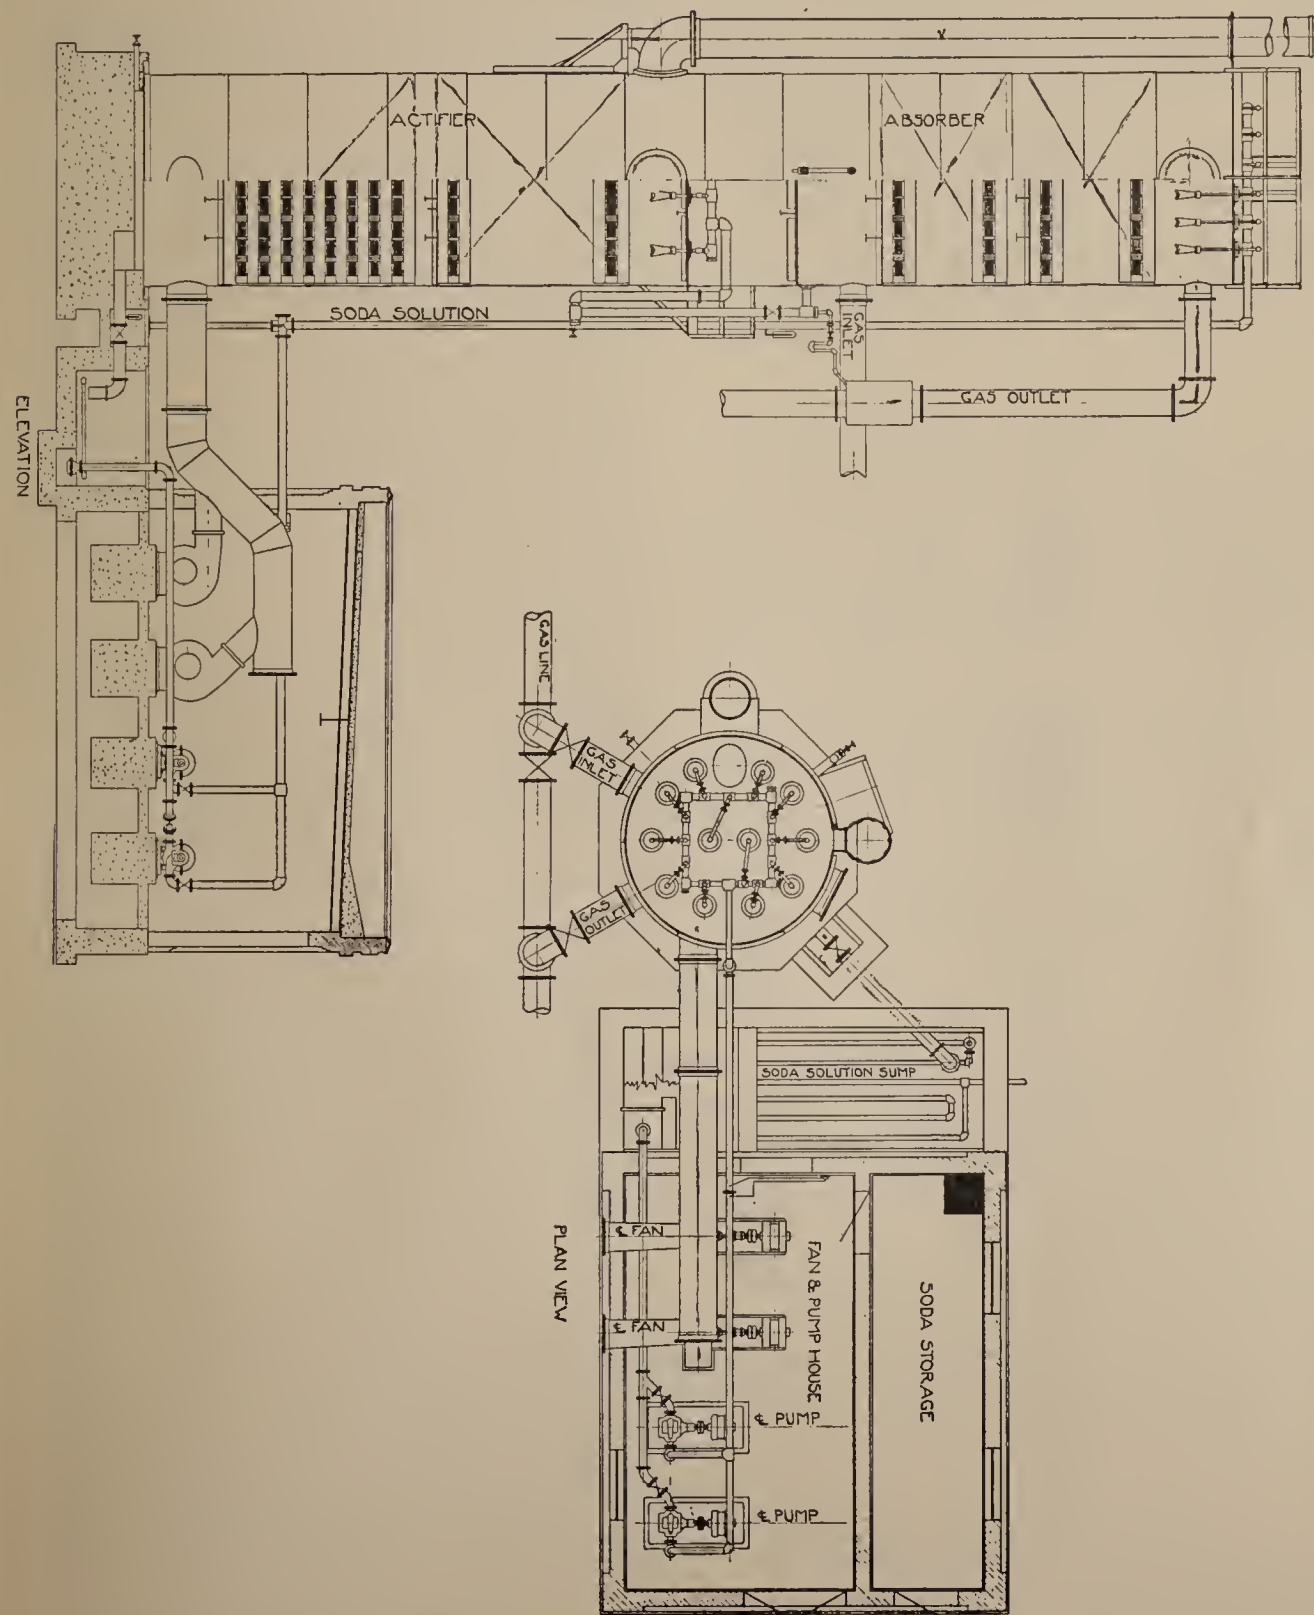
General Arrangement, Koppers Liquid Purification Plant. Single Tower System.
